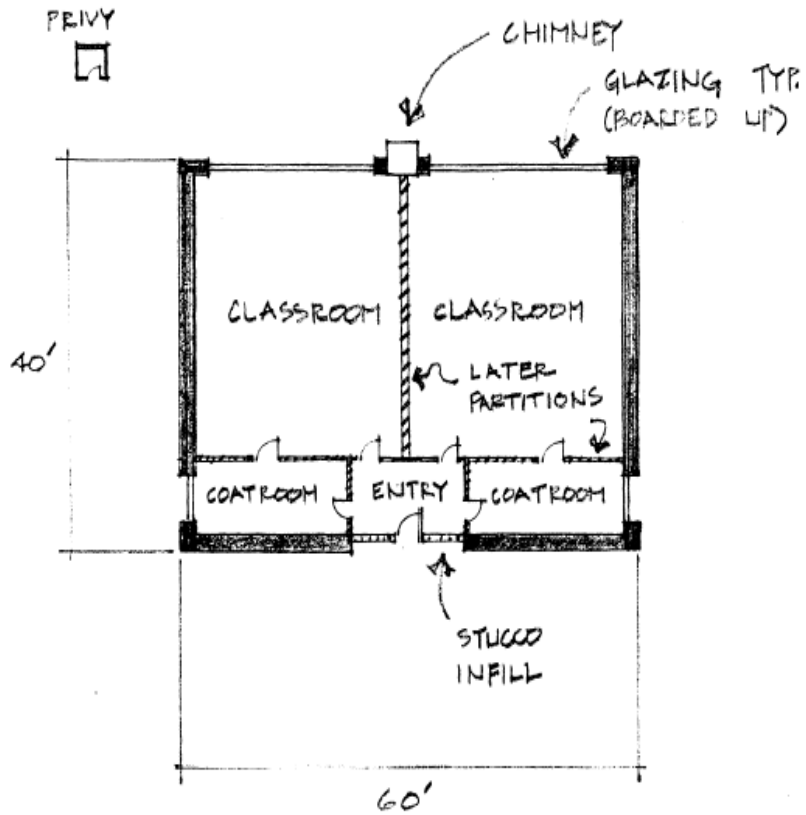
Floor Plan of Carson Schoolhouse (Perry 1986:5)
